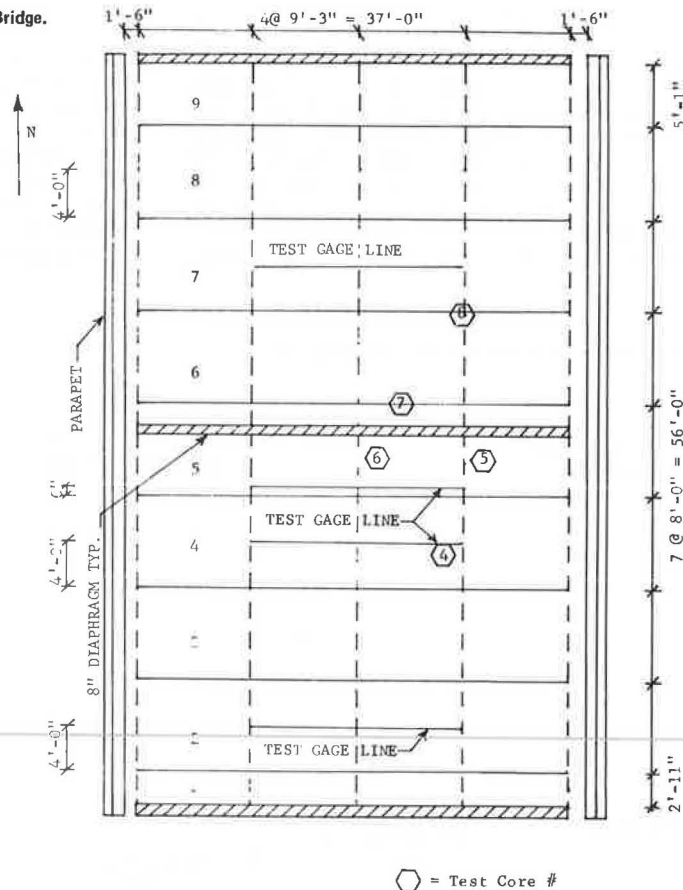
Location plan of gages for span 11R of Peace River Bridge.
